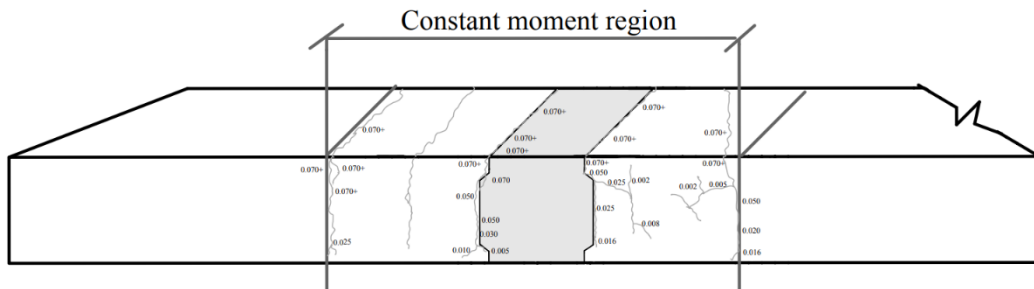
Crack Propagation for Proprietary Long-Term Specimen at Failure
